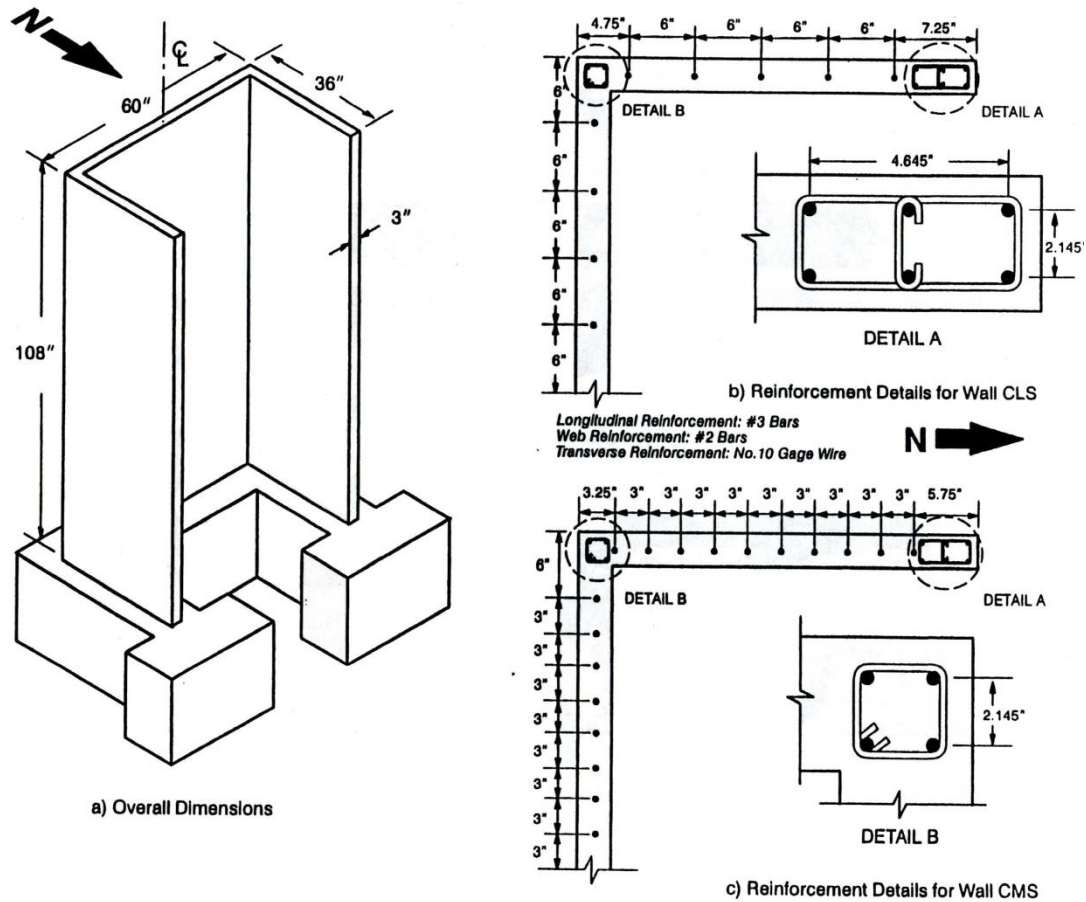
Overall Dimensions and reinforcement details of the C-Walls tested by Sittipunt and Wood [1993]
